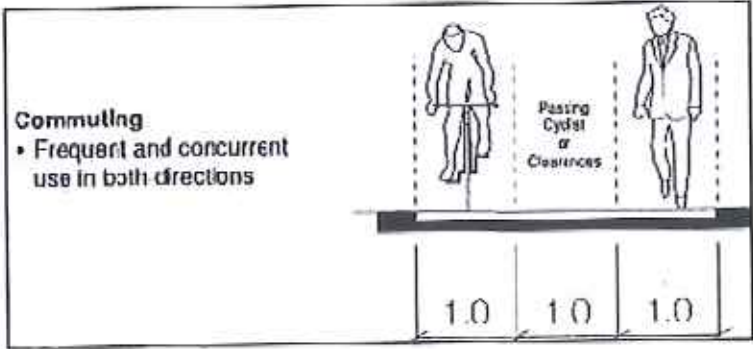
INDICATIVE CROSS STREET SECTION
